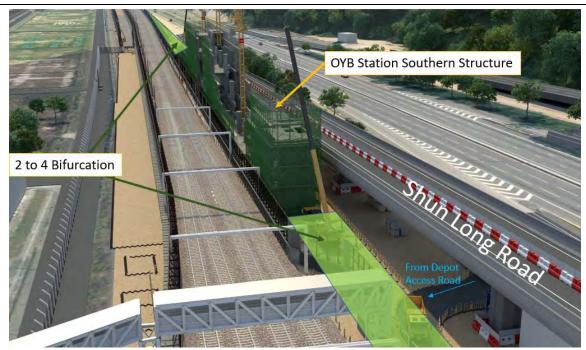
Location of the Proposed OYB Station Southern Structure
